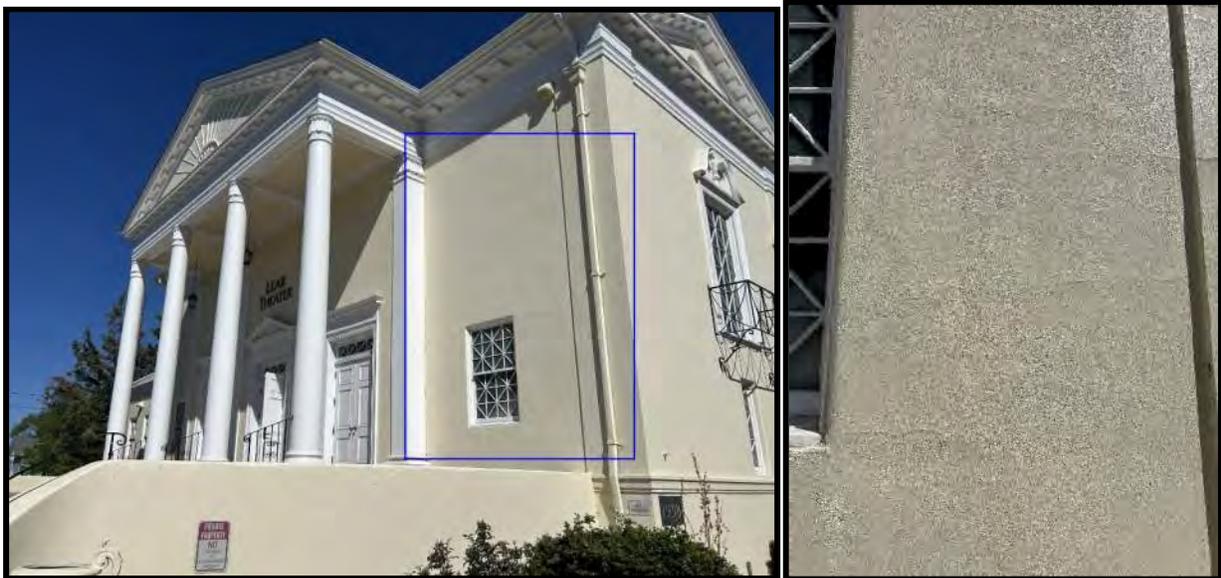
View of cracking in the exterior wall finishes from further away (left) and close up (right) at the south theater entrance.
